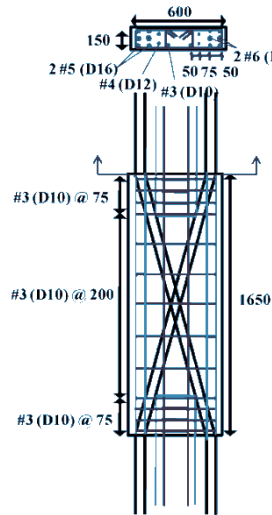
Reinforcing details of the CB275 (unit: mm)
